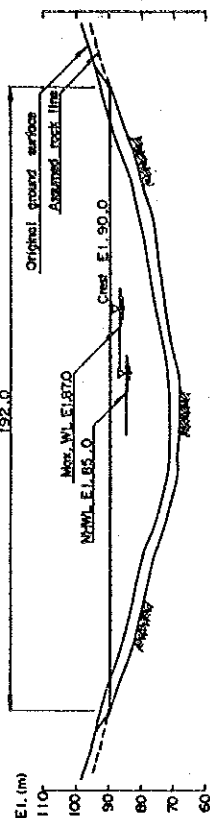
Plan, Elevation, Profile and Section of Beris Dam (1/2)
